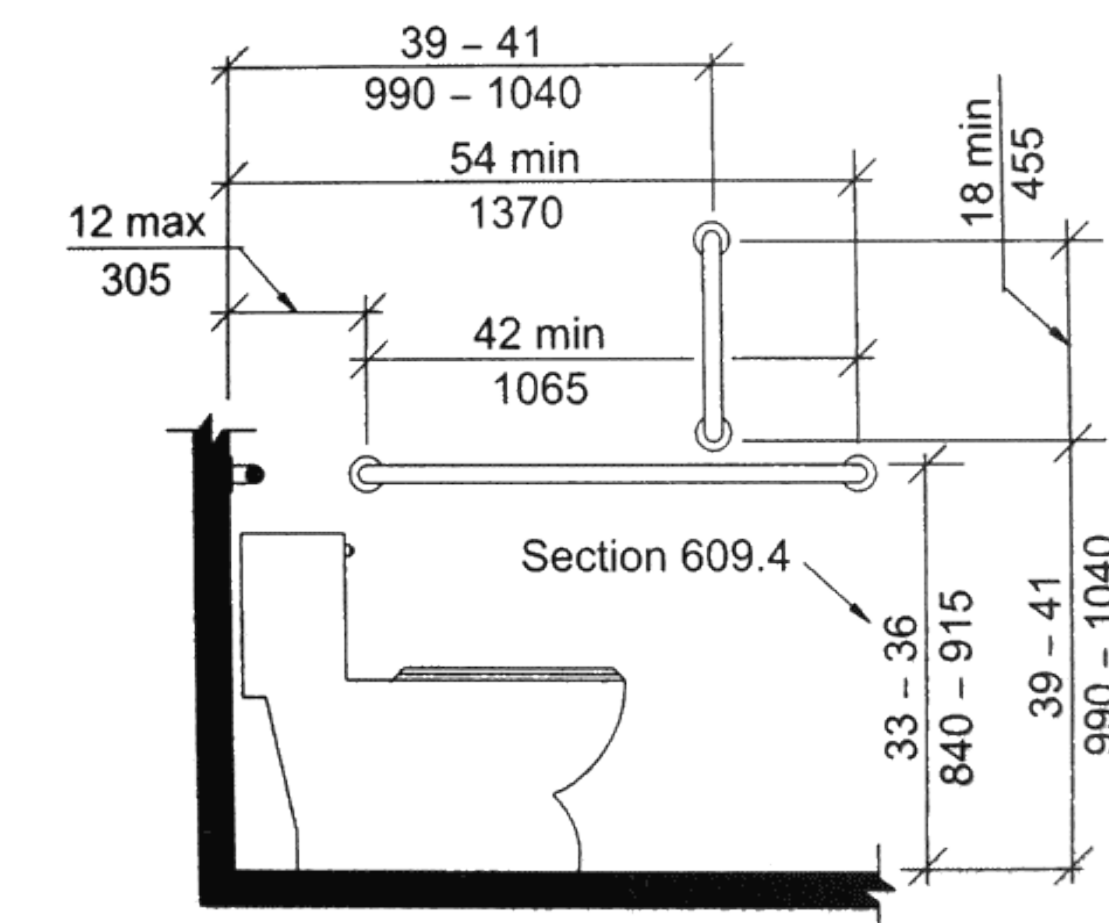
Side Wall Grab Bar for Water Closet
